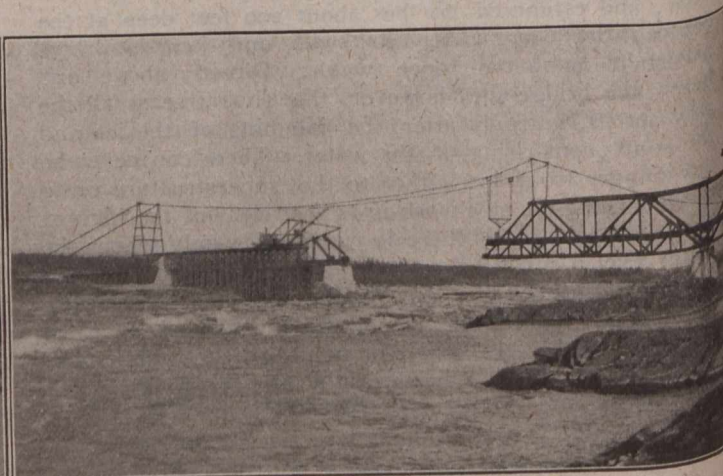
View of Cableway; and Beginning of Erection of Northern Anchor-span, with Traveller at Floor-level
